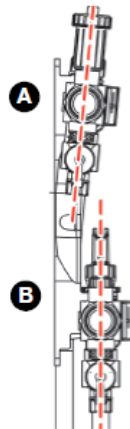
Correct slope of the beams, making it easier to connect the loop of the under-floor installation
